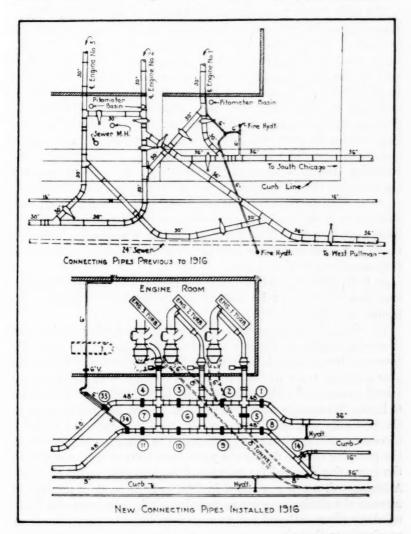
Rearrangement of Connecting Pipes, 68th Street Pumping Station
